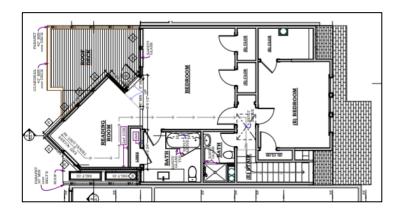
Delano Avenue, 311 Notification Plans, 3/23/15, Case No. 2015.004262, SF Planning Department website
